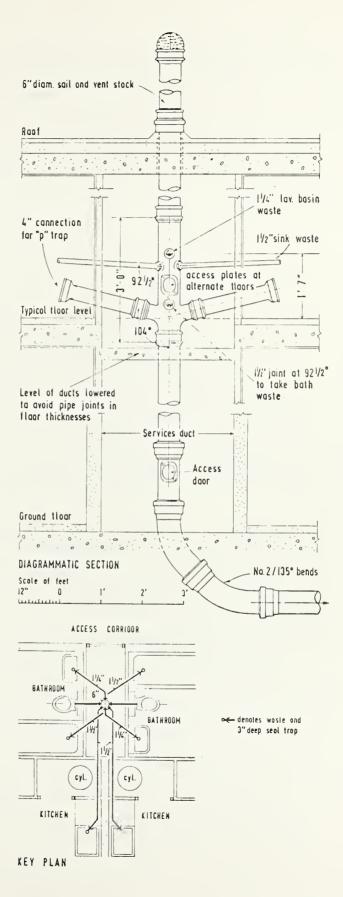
A plan for single stack drainage in 20-story apartment building-recommendations by the British Ministry of Housing and Local Government, 1962. Illustrates back-to-back grouping, 6-in. stack.
